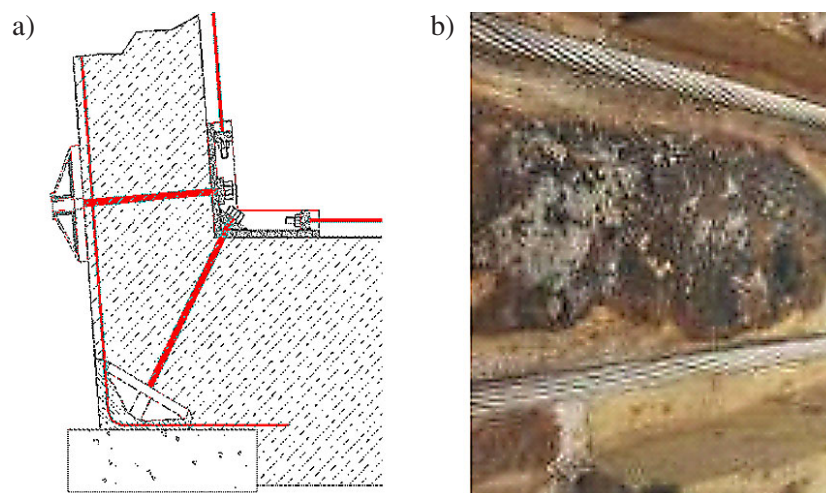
Strengthening interventions, external confining stainless steel cables, Clock Tower, Padova: a) detail of the core strengthened using steel plates and cables; b) detail of the cable insertion between the mortar joints
